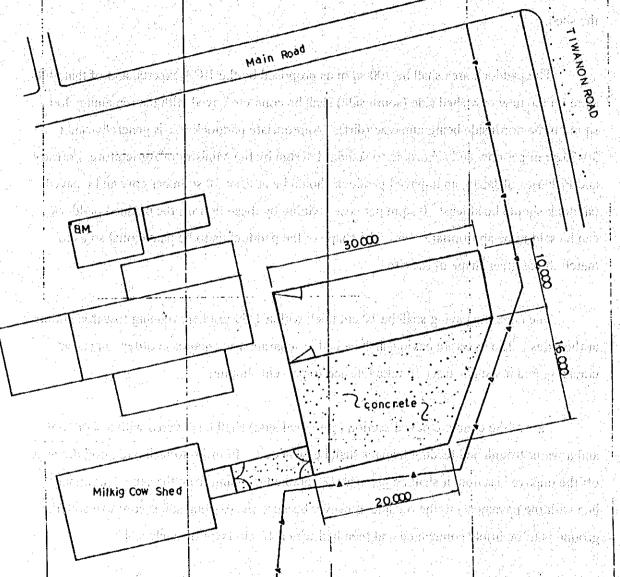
GENERAL PLAN OF PADDOCK SCALE : 1/500
